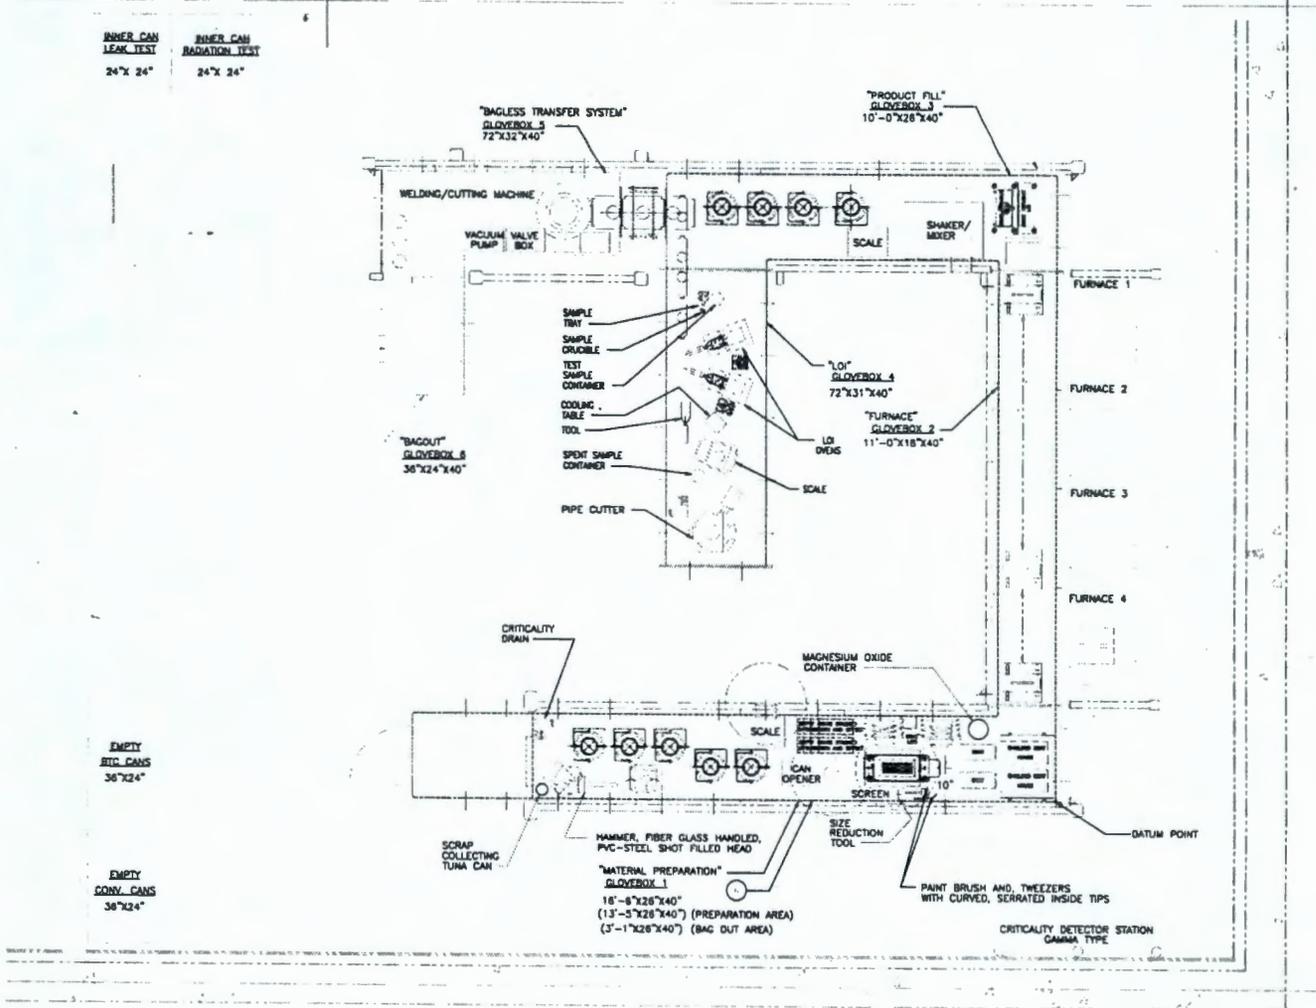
2736-ZB Building, Room 642 Glovebox Layout.
